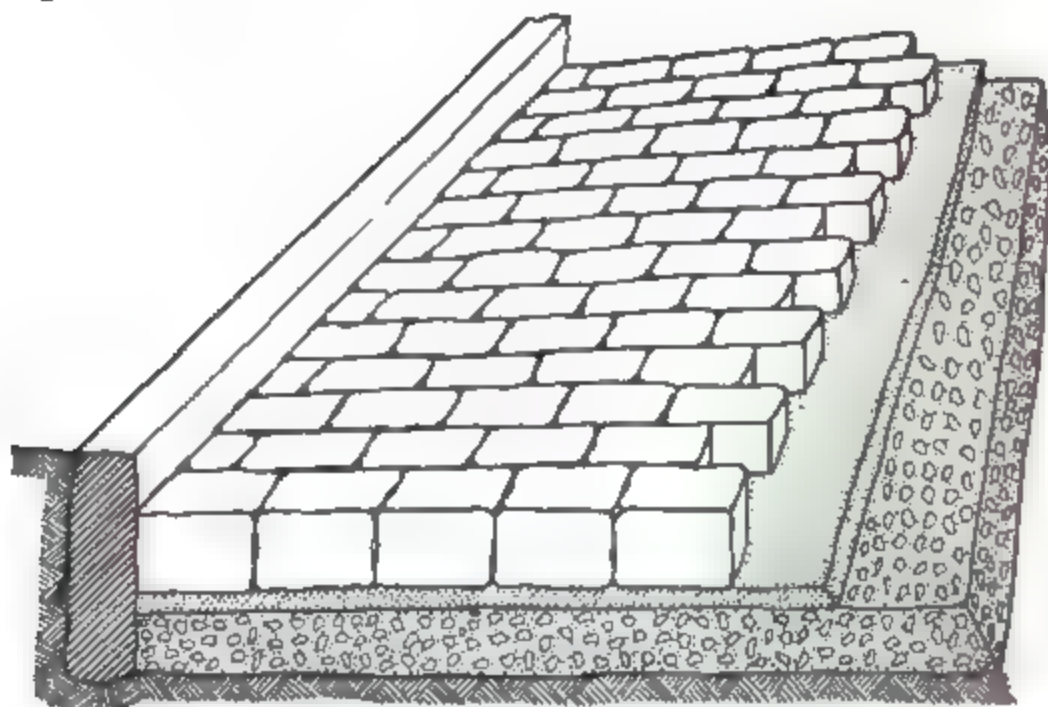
SECTION OF STONE-BLOCK PAVEMENT.
